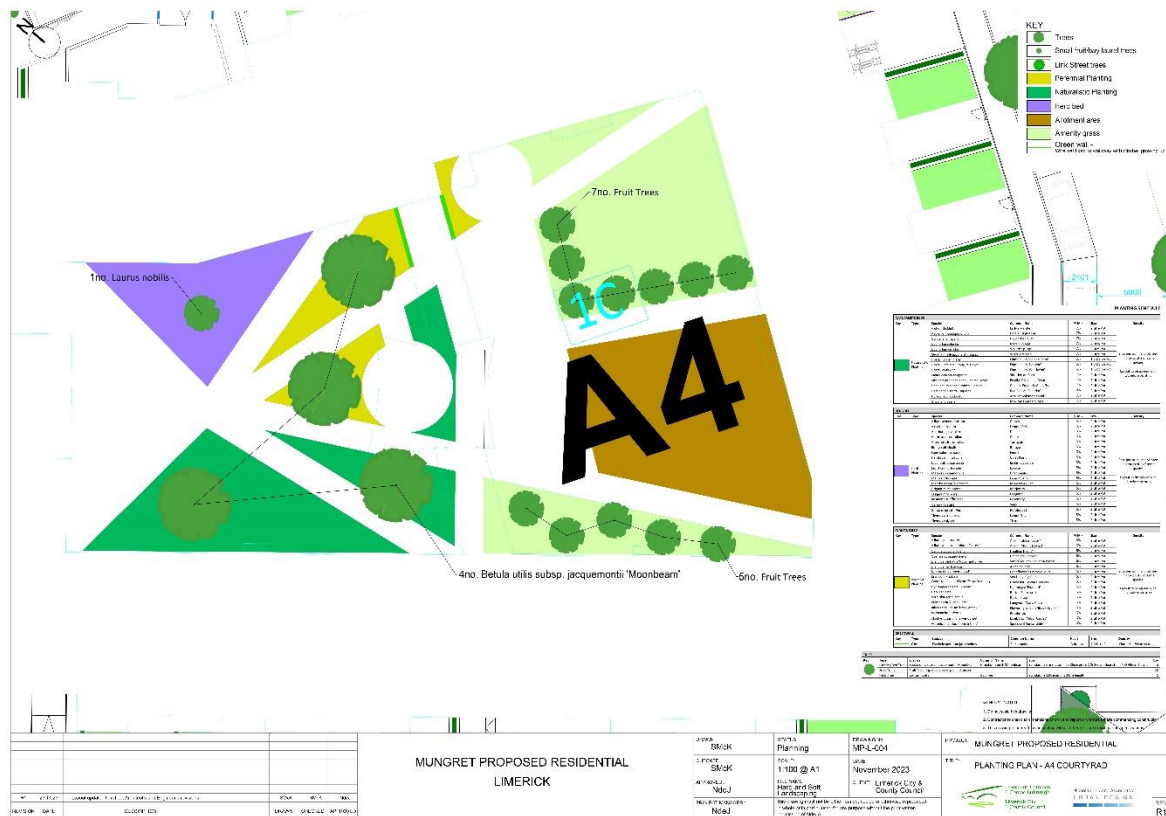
MP-L-004-B Planting Plan - A4 Courtyard
